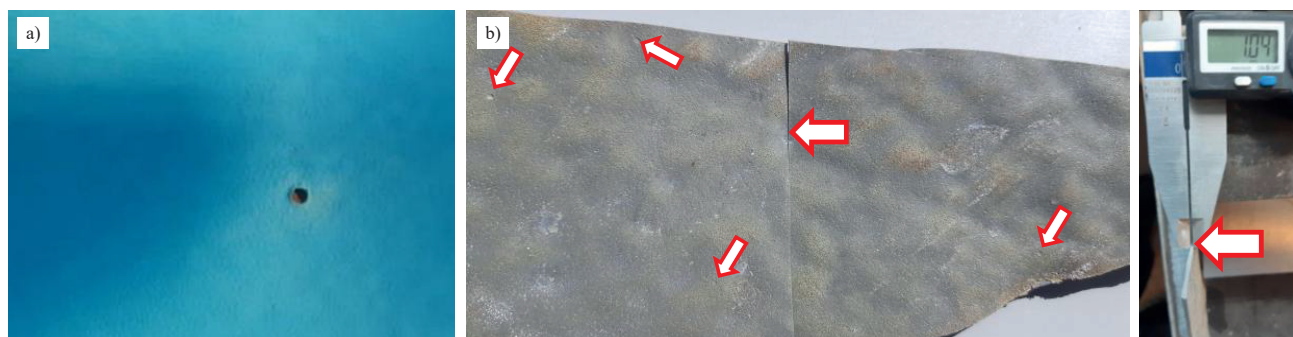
Small holes are the contact point between the pool water and the surface beneath the coating (a) [8]; places of smaller thickness or large defects in the coating caused by the method of applying a polyurea coating, which may be a place of initiation of osmosis (b) [8]
